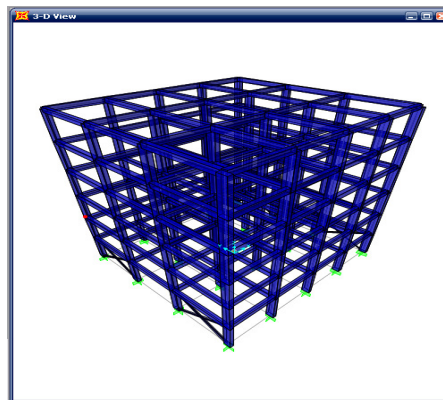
Modelling of Updated Building Case-5 Steel Bracing [06]
